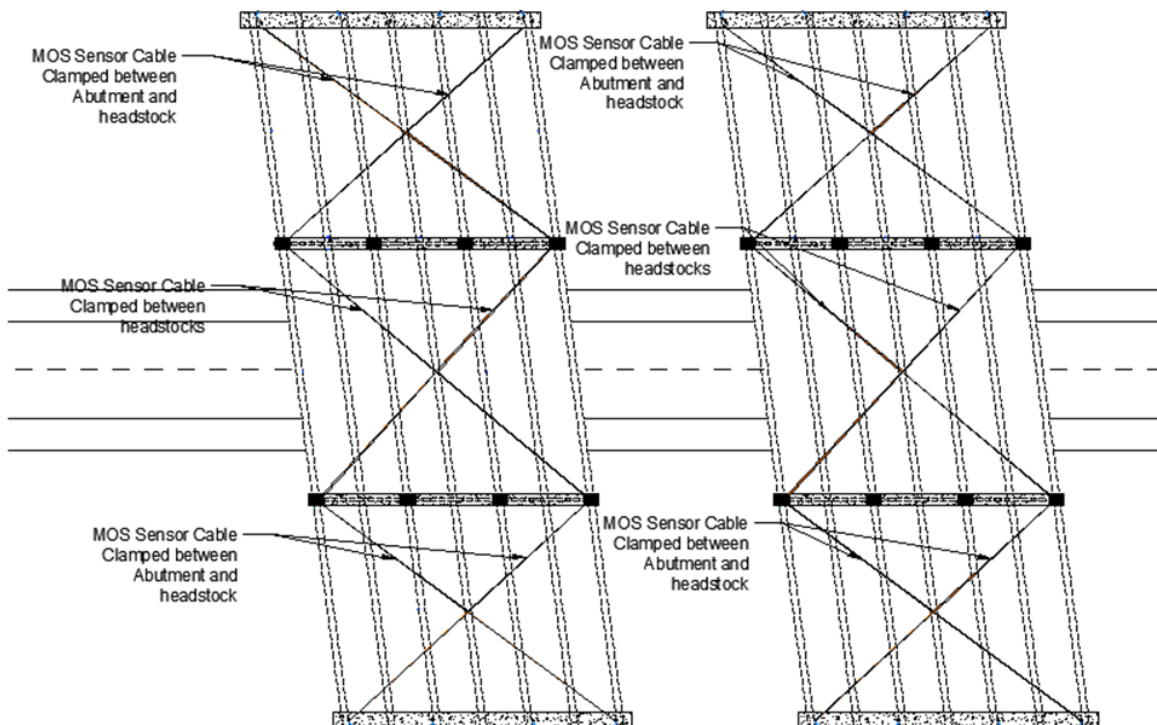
Bridge 2 - FBG Sensor Layout – Abutment Pier Headstocks
